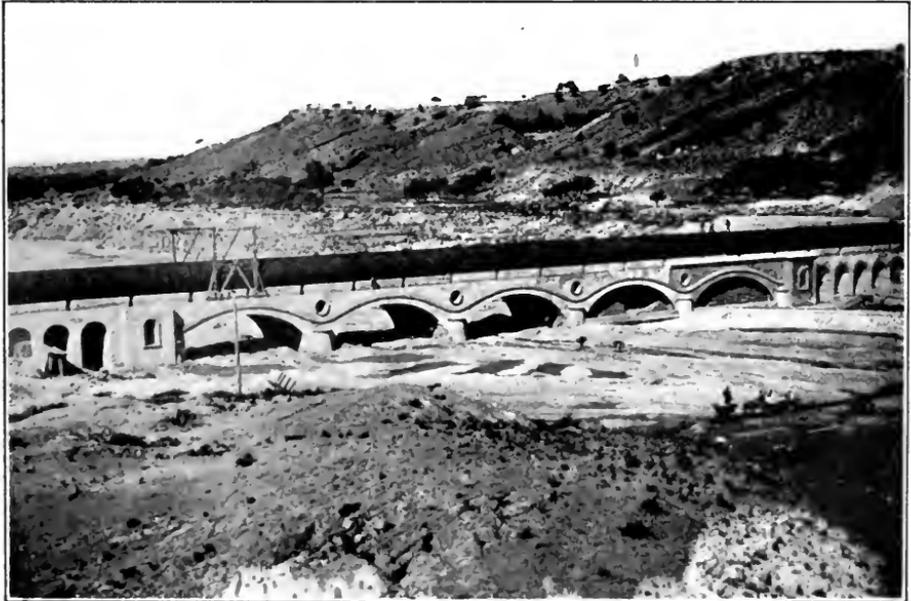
FIG. B.—Steel tubes in position on Sosa River Bridge, Spain.
